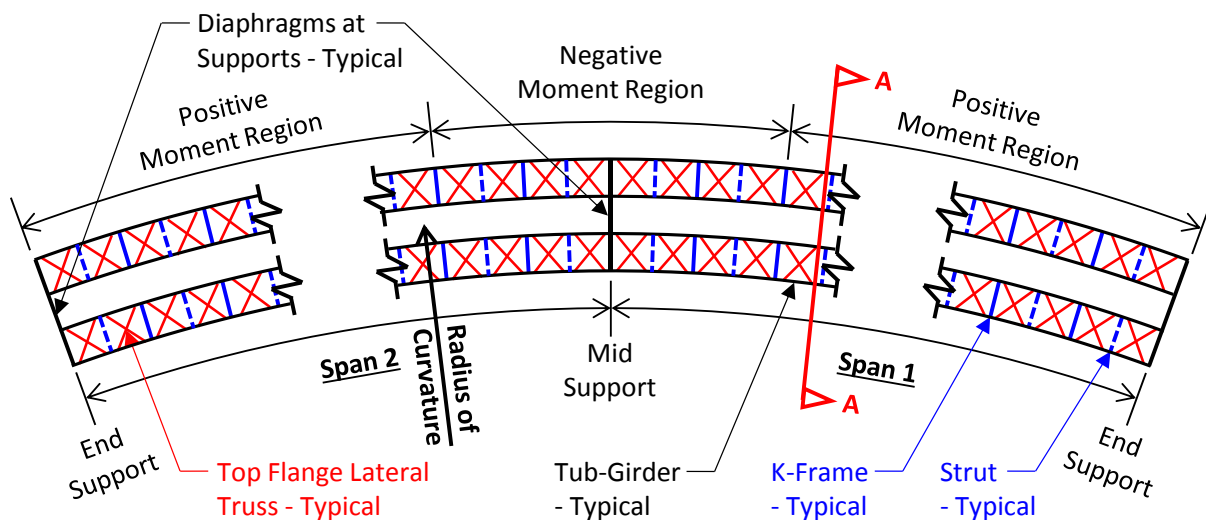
Tub Girder Layout for Parametric Study – Plan View
